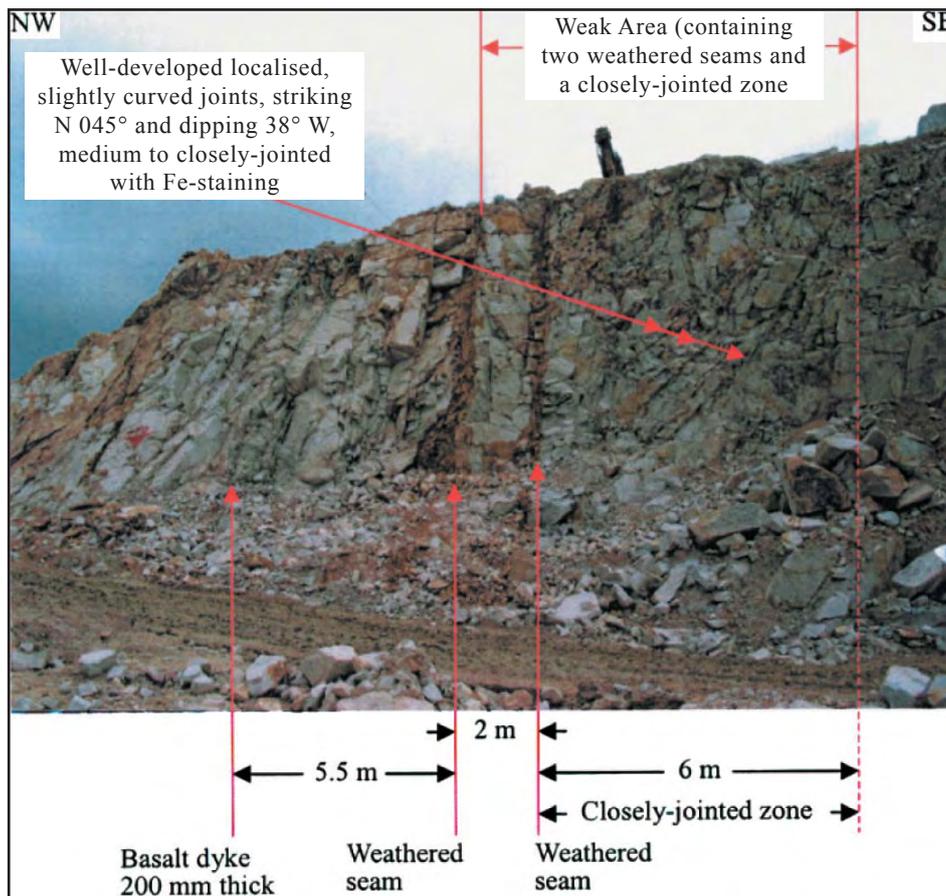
Weak area 45 m southwest of the blast location near New Clear Water Bay Road (Massey & Siu, 2003)
